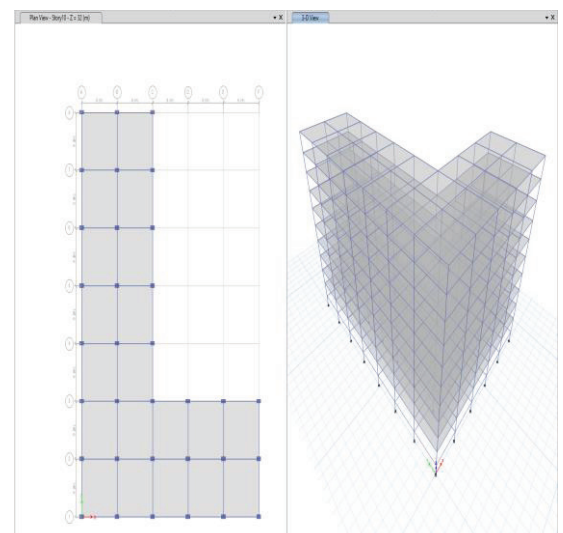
Plan and Isometric view of Model-3 with LRB G+10
